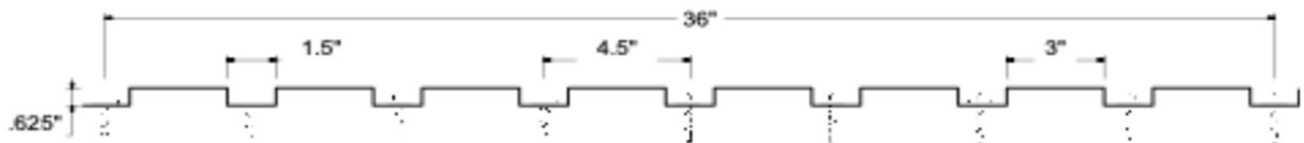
11 TMP LITE WALL .625-4.5-36 PANELS (8 SCREWS)
